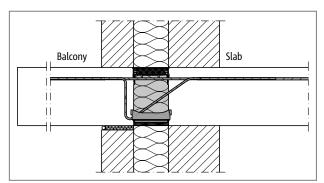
Schöck Isokorb $^{\otimes}$ XT type K: Cavity wall with a balcony at inner slab level
